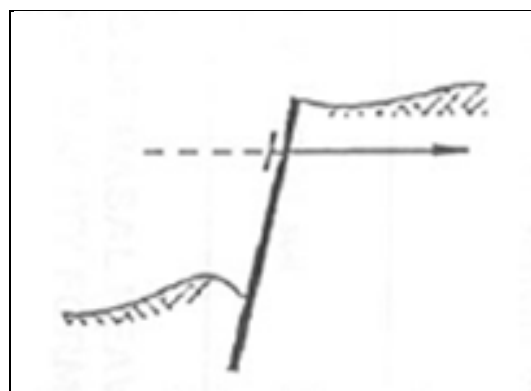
Failure of anchored wall by rotation about anchor [2]
